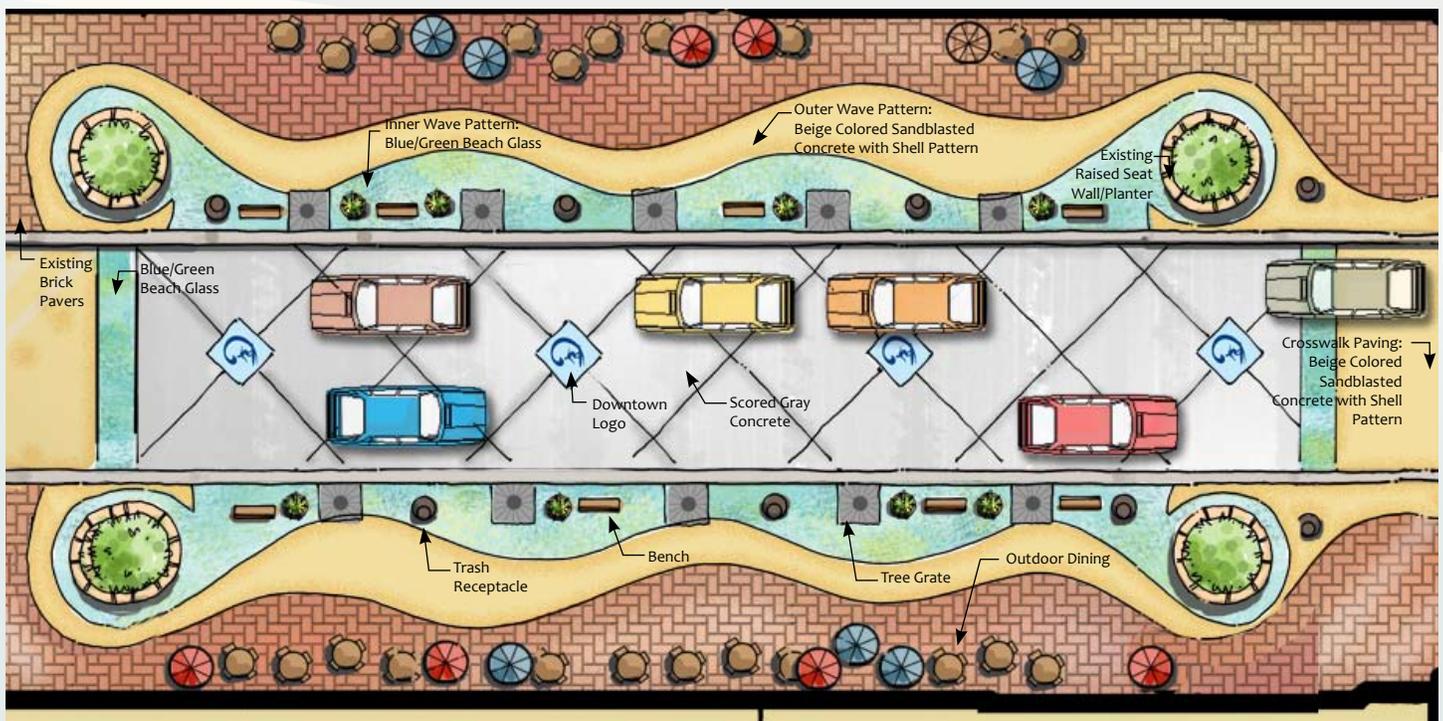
Plan view along Main Street featuring a wave pattern of tumbled beach glass incorporated into the sidewalk paving
